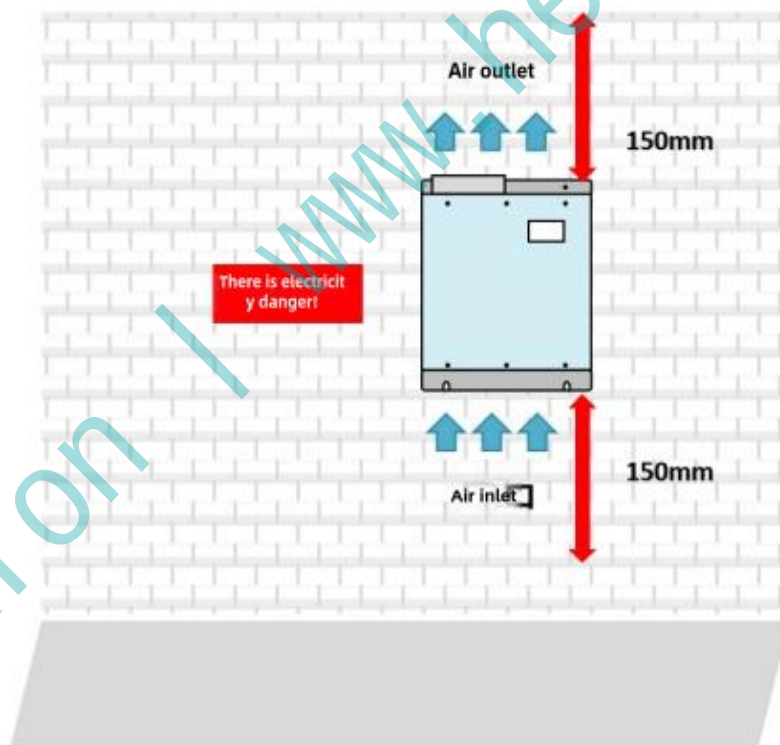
Schematic Diagram of Space Requirements for Wall-Mounted Module Installation
